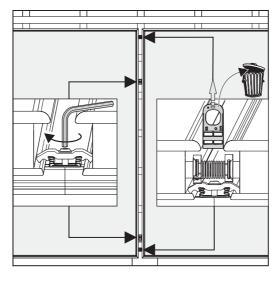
Tighten double clamping blocks between the flat solar panels and detach assembly supports from the expansion joints.
